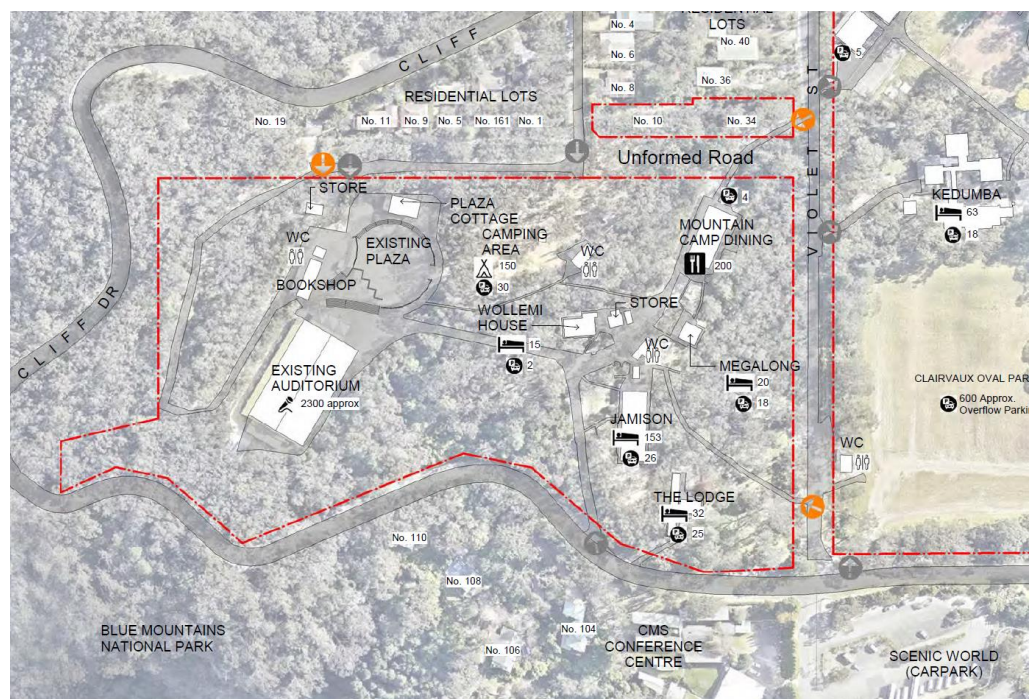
Existing site plan (Source: NBR Architecture Drawing reference 14289-004 dated 4 December 2017)
